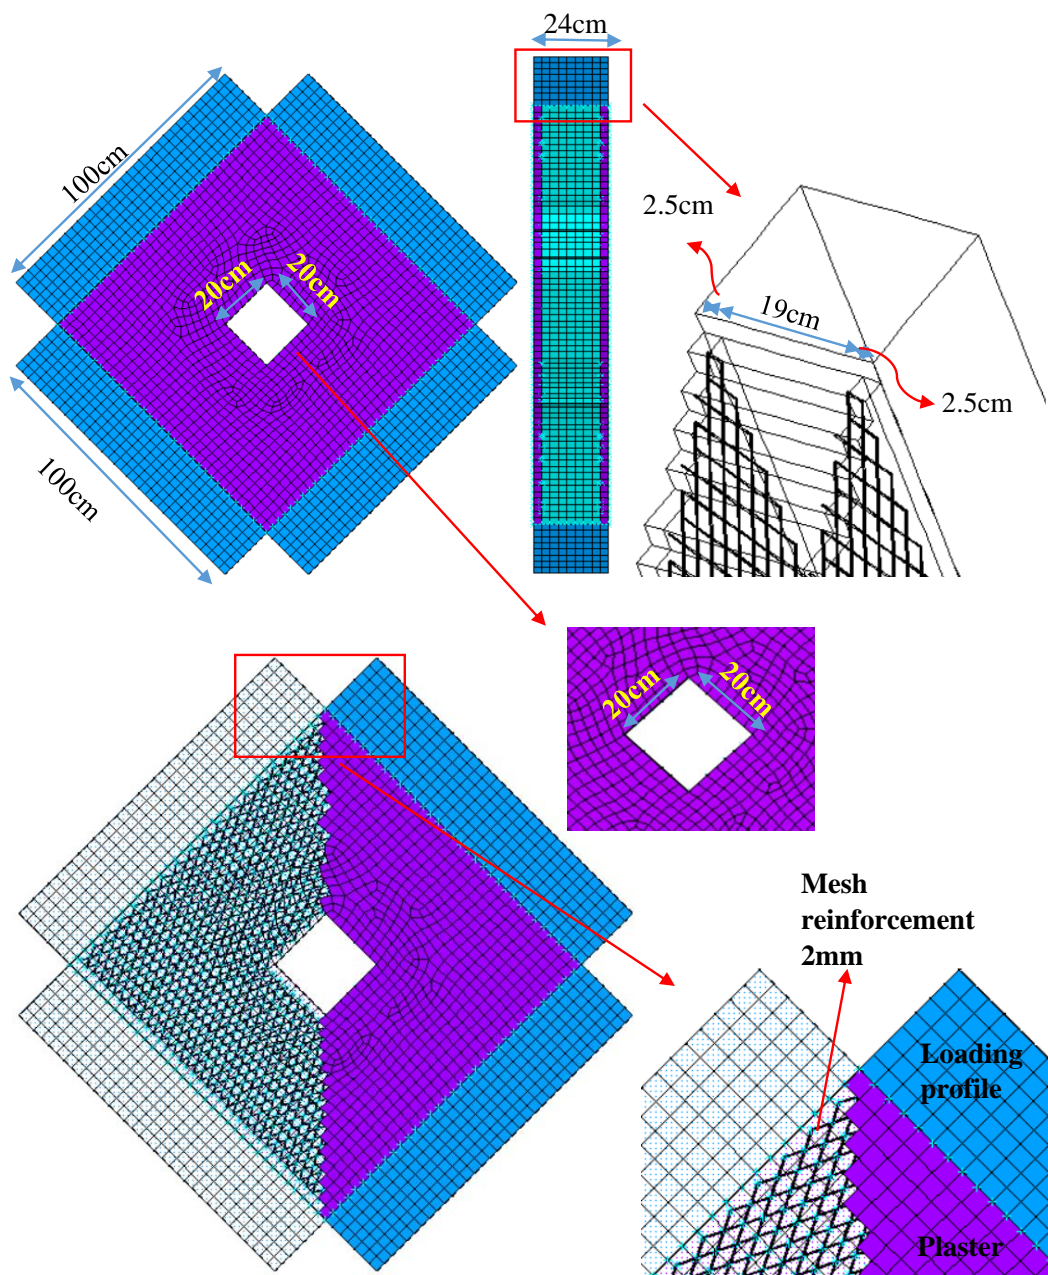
20% opening ratio of the masonry wall model-2.0mm mesh reinforcement
